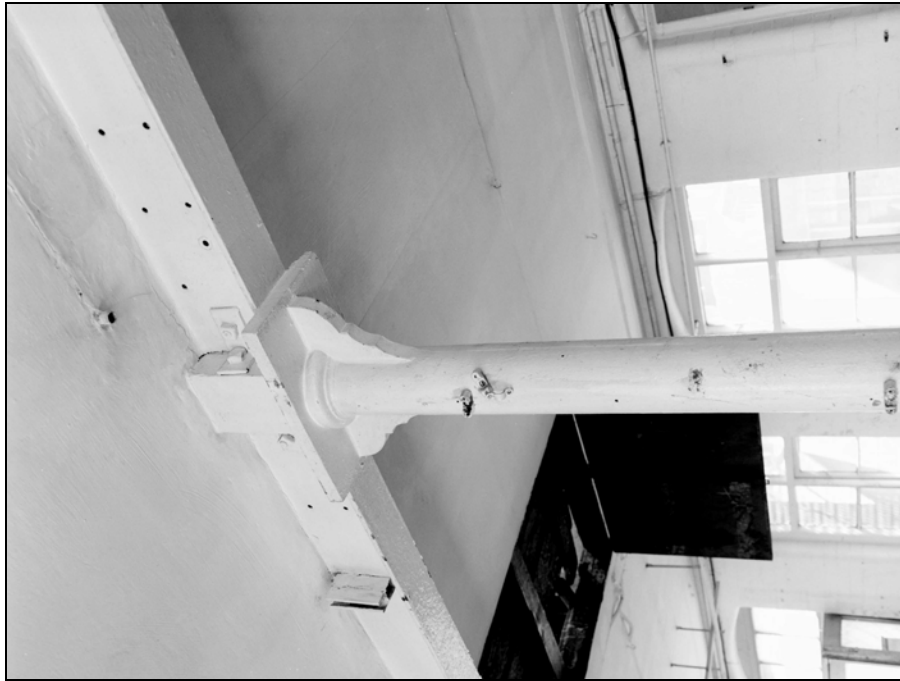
Building 3; first floor, detail of column capital, A21 (Film 4.8)
